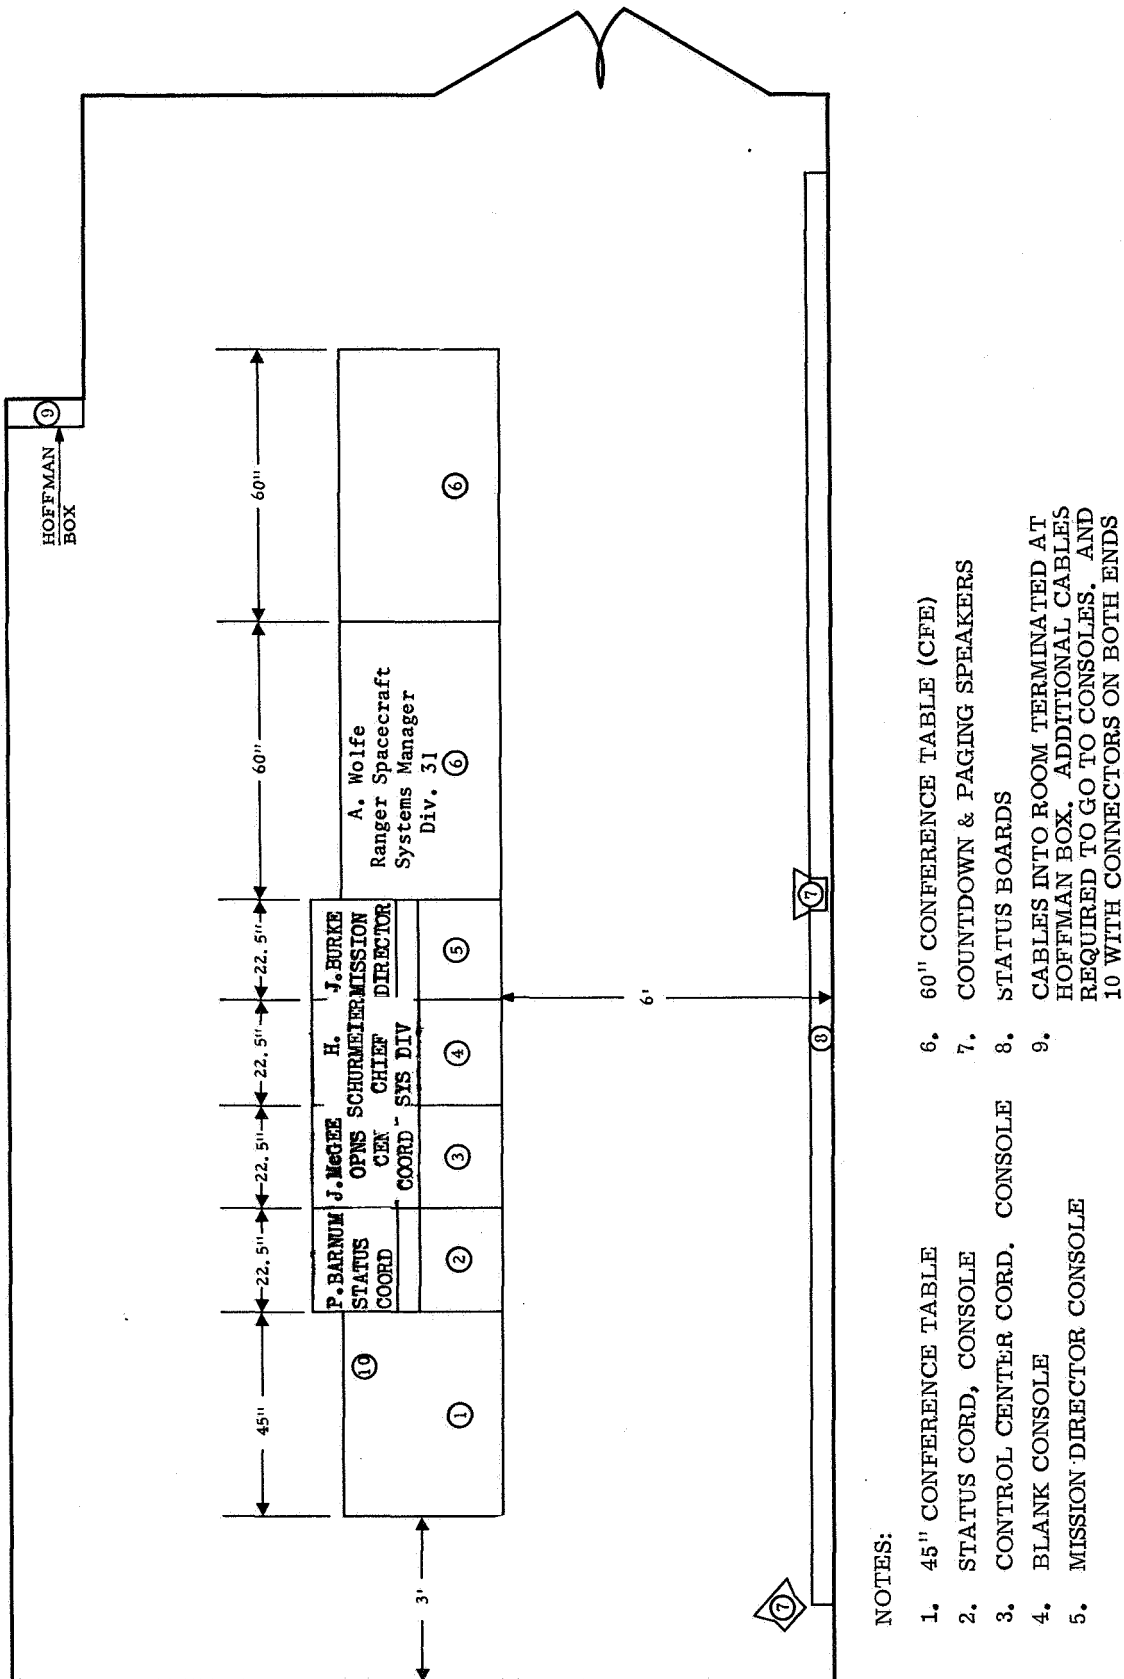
JPL MISSION OPERATIONS CENTER (MOC) FLOOR PLAN
